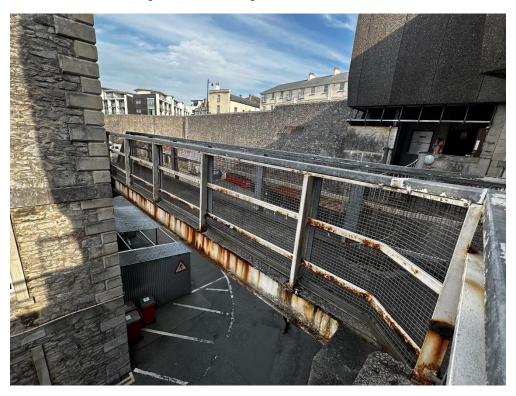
General view looking East of gantry bearing onto retaining wall at higher level
